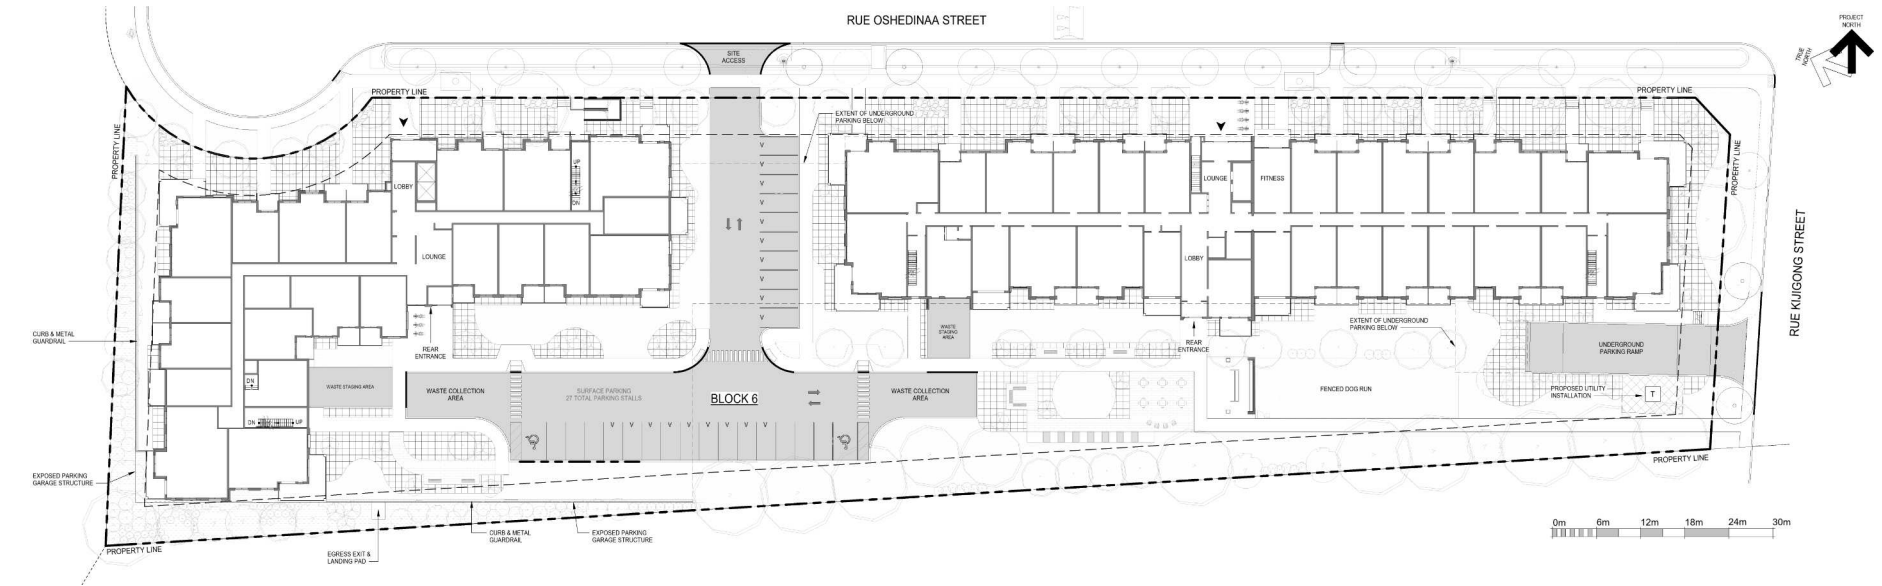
Block 6 ground floor plan in context demonstrating relationship of units and common areas to public realm (September 2024).
